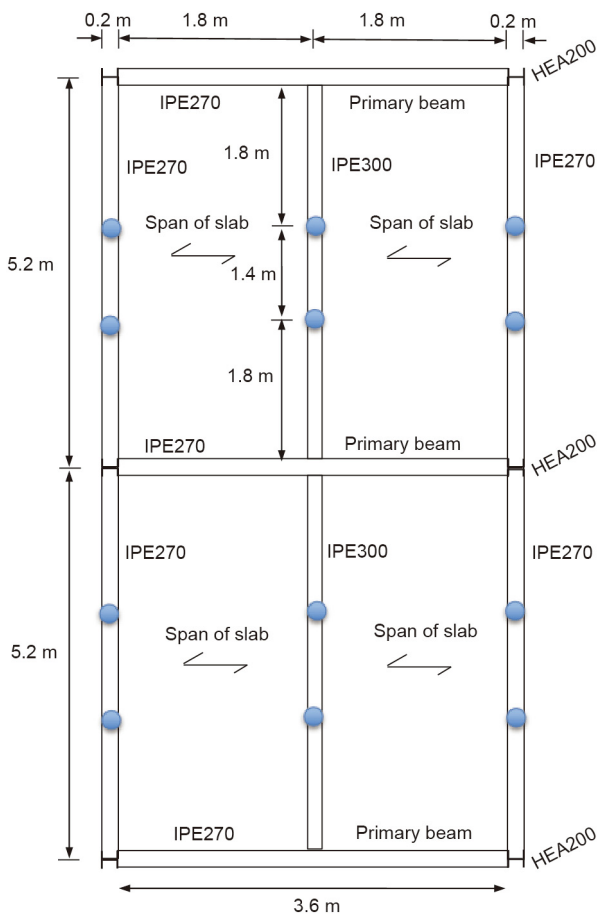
Beam arrangement and floor plate dimensions. The blue spots represent the point load applied to the internal beam (test 1) and the external beam (test 2). The load cells were placed under the central columns.
